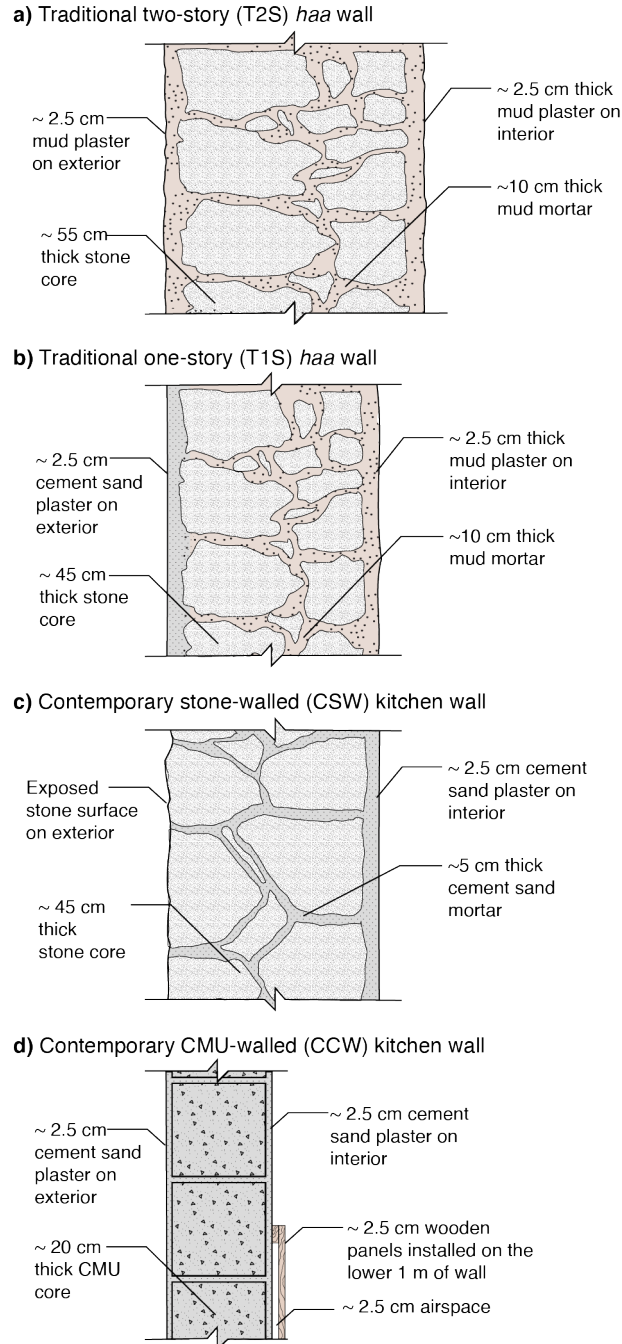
Wall constructions in the winter living areas of sampled houses : (a) Traditional two-story (T2S) haa wall with 55 cm thick traditional stone masonry; (b) Traditional one-story (T1S) haa wall with 45 cm thick retrofitted traditional stone masonry; (c) Contemporary stone wall (CSW) kitchen walls with 45 cm thick contemporary stone masonry; (d) Contemporary CMU-walled (CCW) kitchen walls with 20 cm-thick CMU block masonry with wooden panels up to 1 m above floor level.
